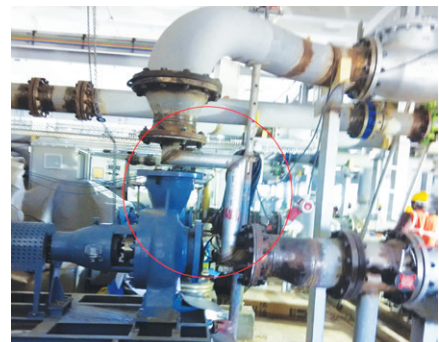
Bypass line for initial flushing to avoid pump impeller damage
